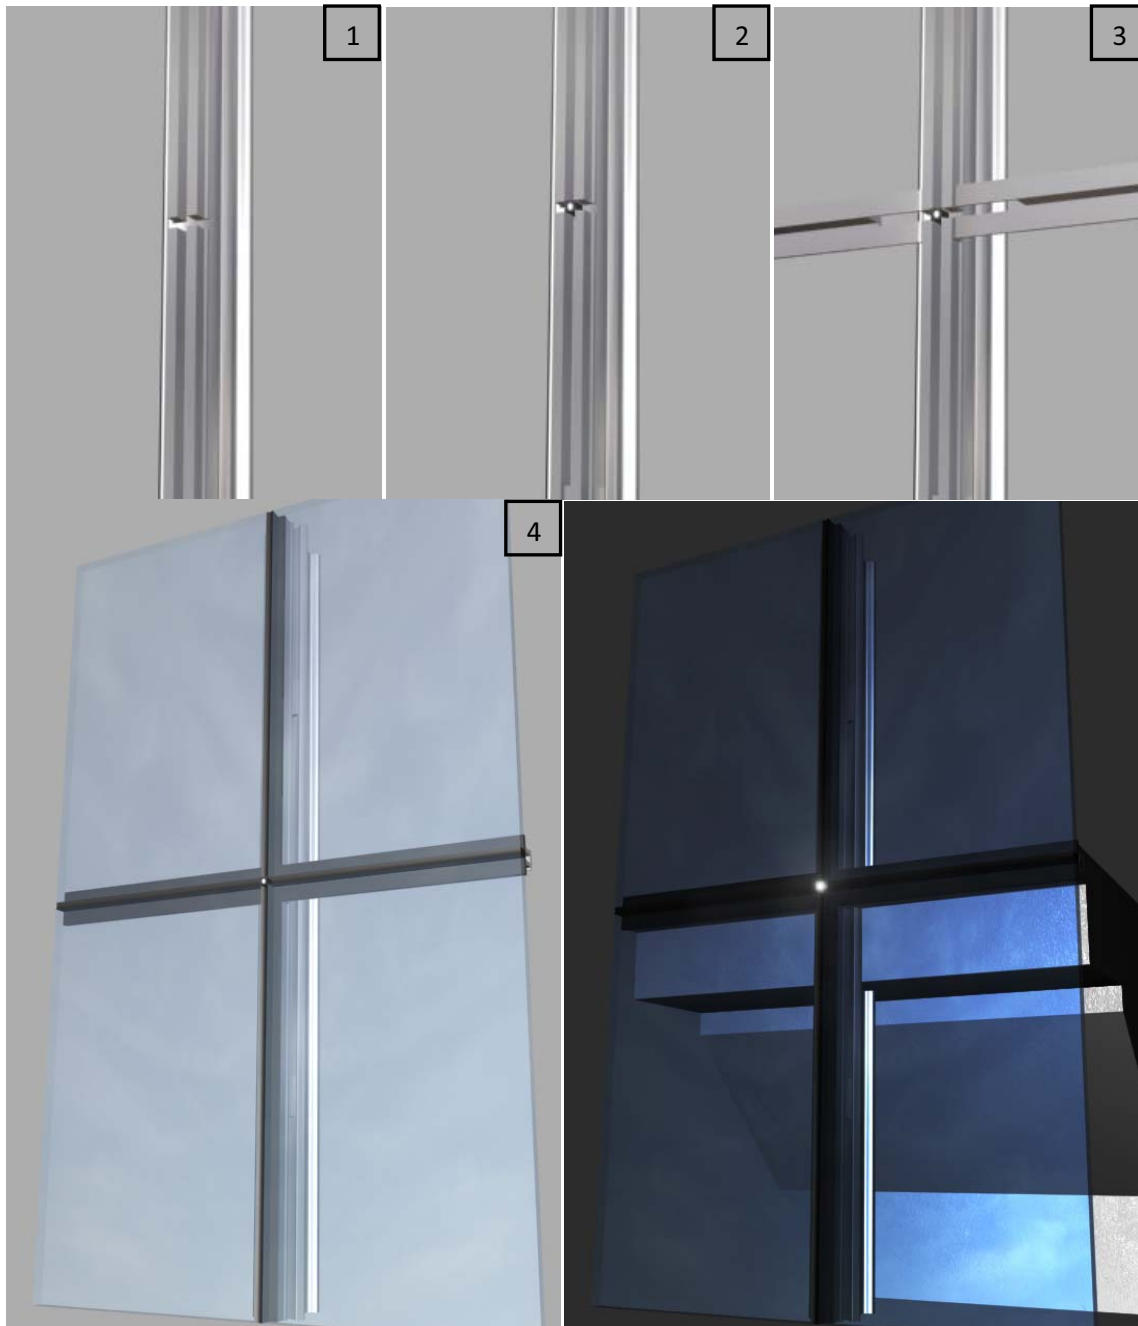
CONSTRUCTION SEQUENCE FOR FIXTURE TYPE F29
